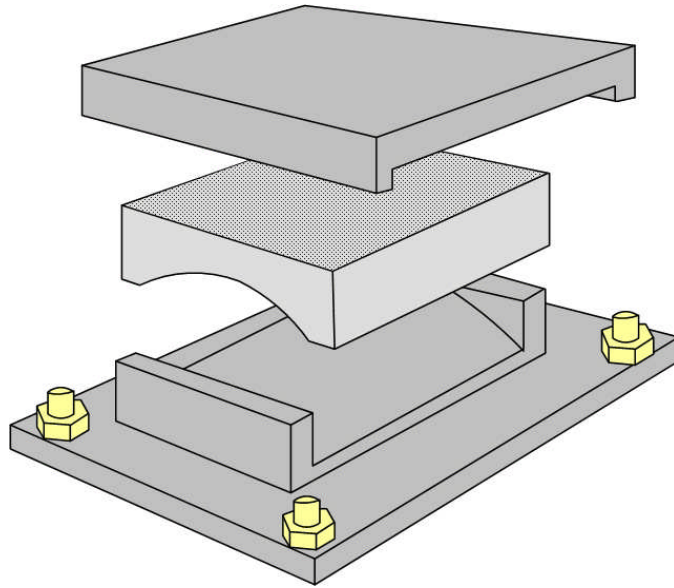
Self-lubricating Bronze Sliding Plate Bearing
